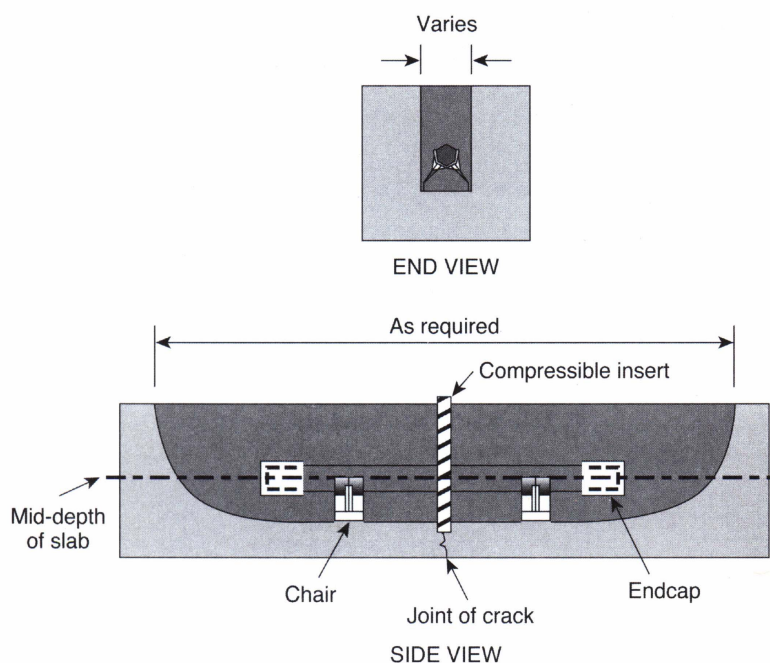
Retrofitted dowel installation details (ACPA 2006).
